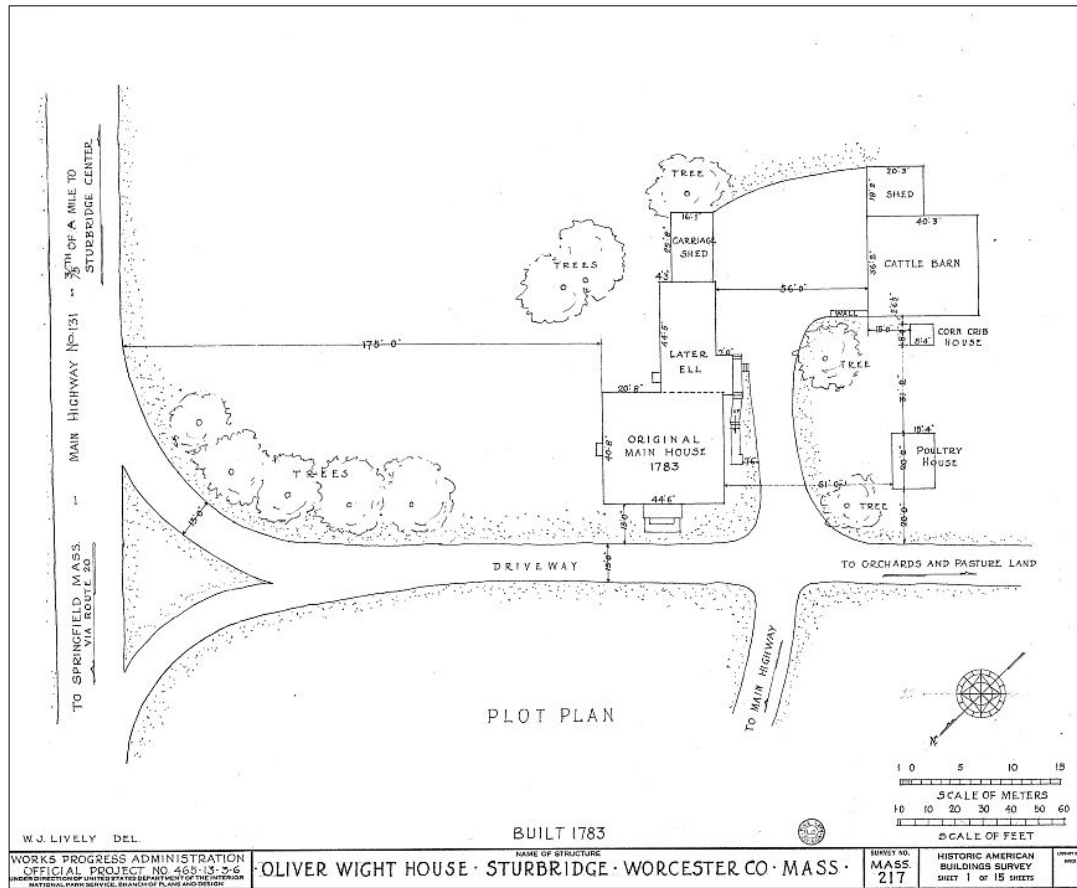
Oliver Wight House site plan, 1936–1938 (Historic American Building Survey).
